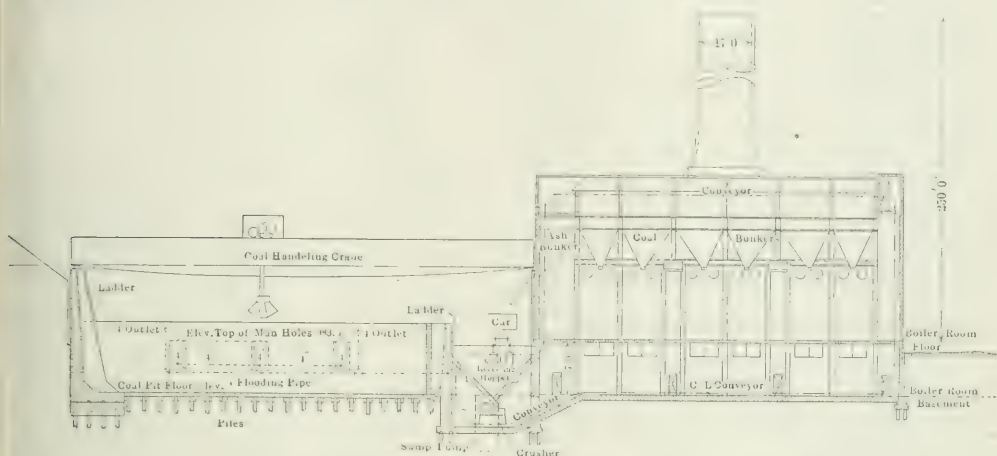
Section Through Under-Water Storage Pit and Power House, Omaha.
